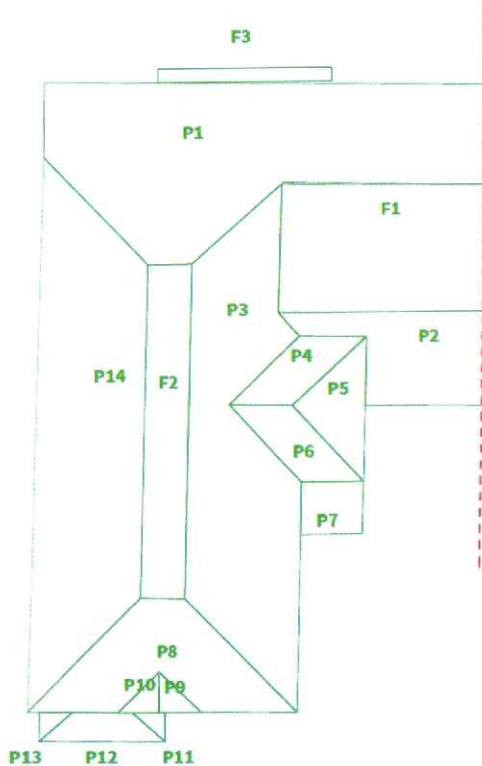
Components of relevant roof. F is flat, P is pitched.
